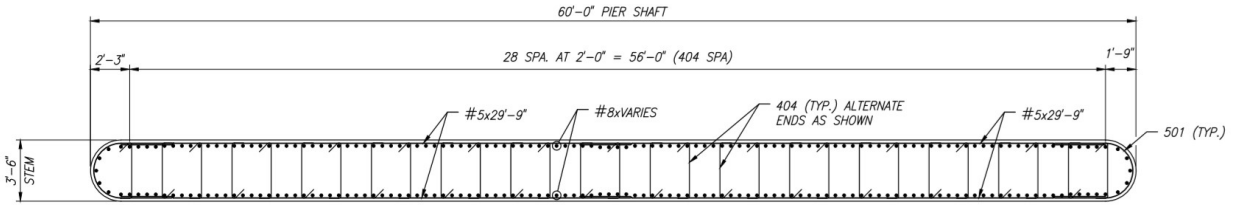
Cross-section of Typical Interior Pier of Bridge (NBI 5941) (2014)
